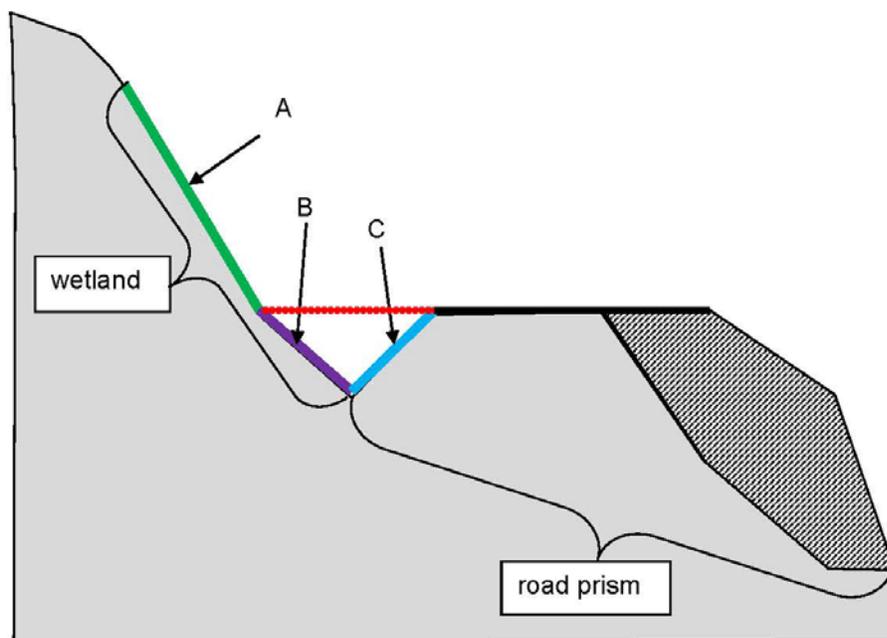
Cross-section of cut slope wetland and roadside ditch.
